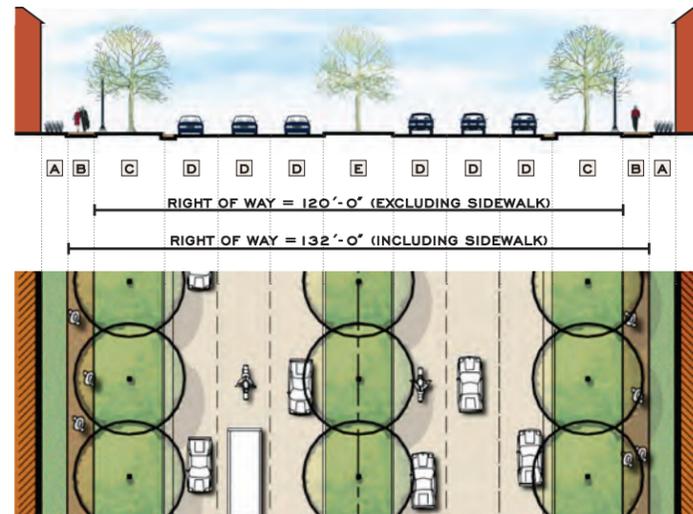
Boswell's Corner Street Section & Plan – Jefferson Davis Highway (US-1)
